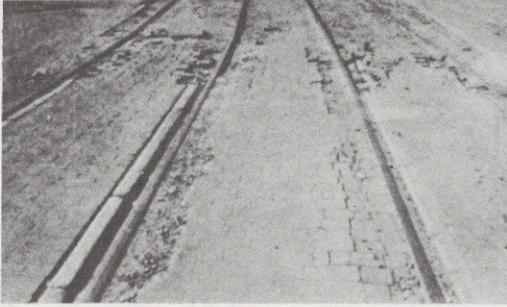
Bridge 24. West End of Bridge. Streetcar Rails Moved Laterally 15 Inches to the North When Blast Effects Shifted Bridge Deck (1,000 Feet to Gz, 2,230 Feet to Az).
